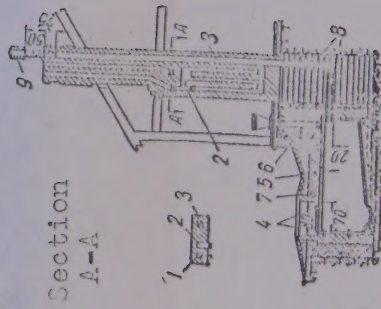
Ventilated Toilet; 1. Chimney Flue; 2. Draft Flue from Kitchen; 3. Ventilation Duct from Cesspit; 4. Cesspit Hatch with Double Cover; 5. Cesspit; 6. Inlet Pipe; 7. Reinforced Concrete Cesspit Roof; 8. Cesspit Ventilation Pipe; 9. Deflector.
